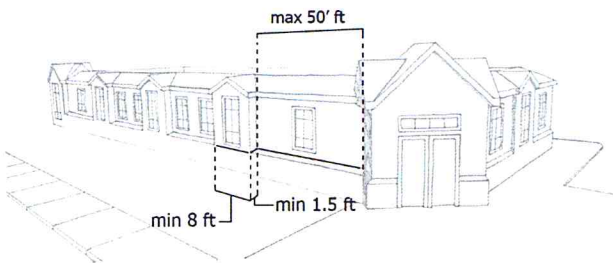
(Façade Articulation): Both single- and multi-story structures must provide a change in plane where the façade exceeds 50 feet in width. The graphic above indicates where these changes may occur in accordance with Subsection 120-69.2
